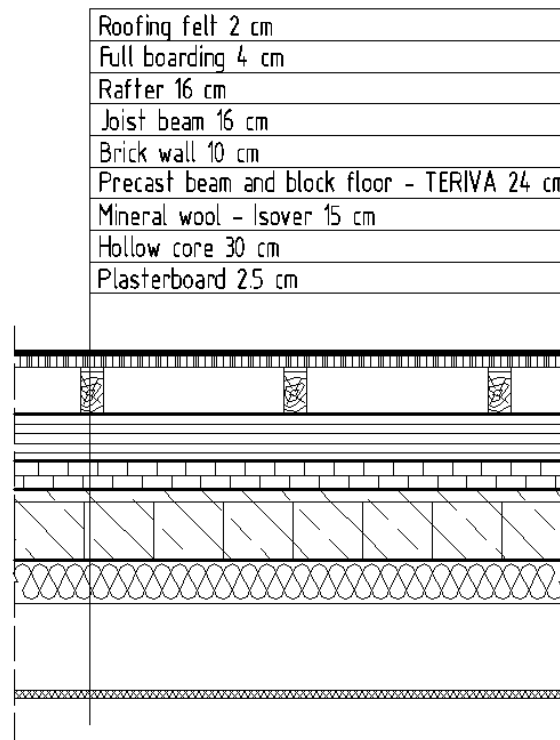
Structure of the roof cross section 3-3.
